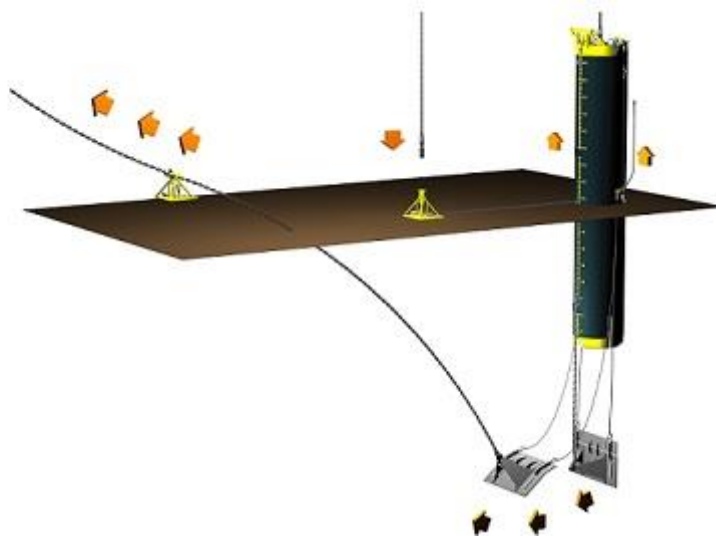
Plate anchor installation ([www.intermoor.com](http://www.intermoor.com))
